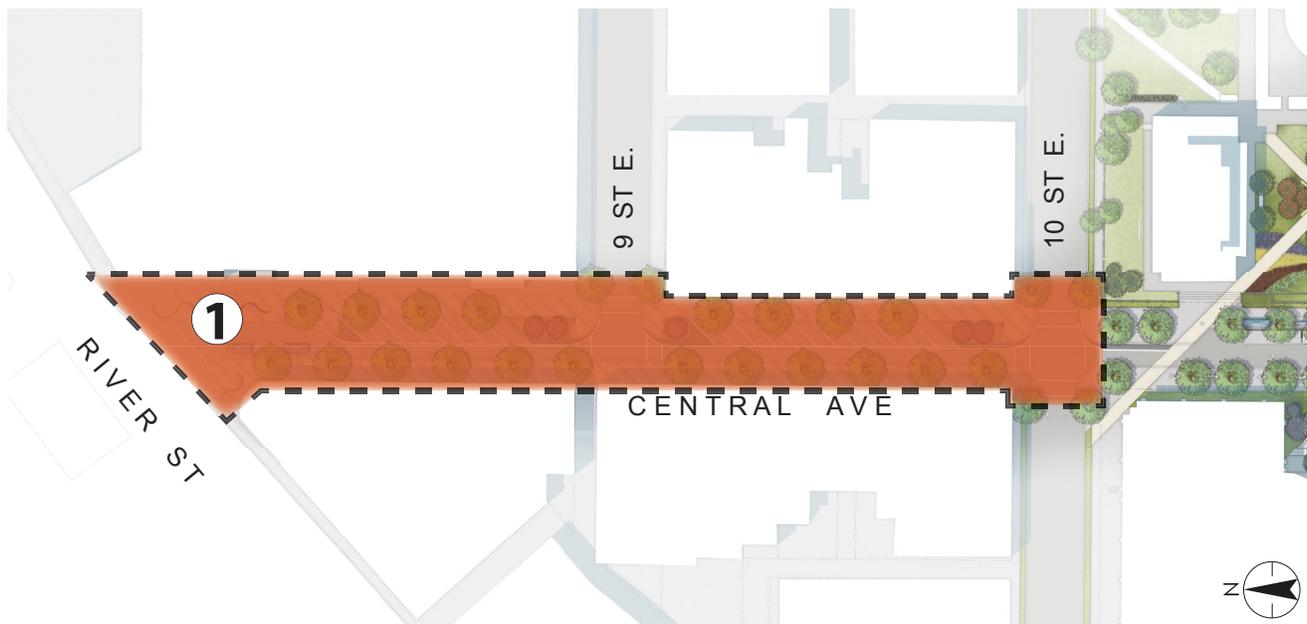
Central Avenue Construction Phase 1 Plan
